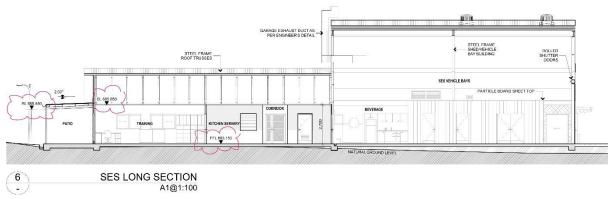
A: Floor level of SES building lowered by 300mm and increase in height of building – s.4.55 Modification (source: F&J Tepa)
